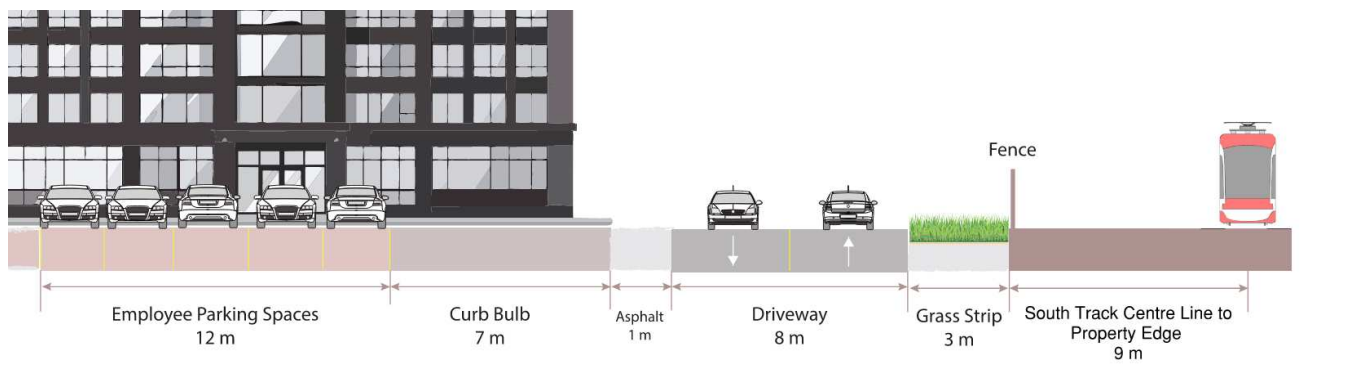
Development Cross-Section of the Proposed Loading Bay Area (Parsons, 2026).
